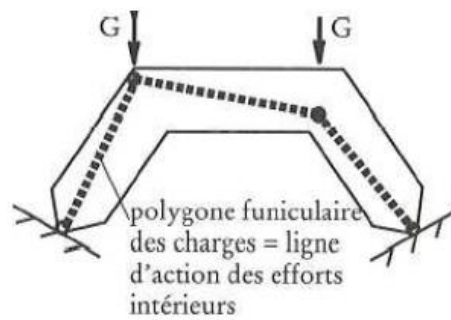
Schematic Illustration of the Thrust Line within the Longitudinal Section of the Arch - (Gens F. , Design and Construction of Bridges - Chapter 03b-1 - Arch Bridges, 2024)
